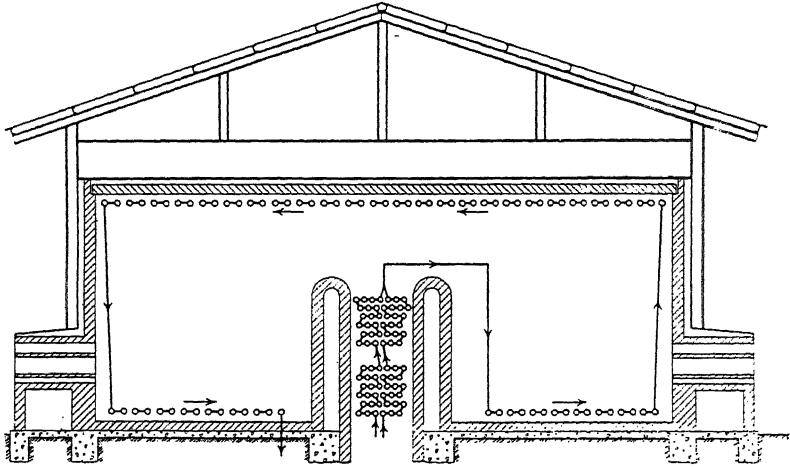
Foster Wheeler Heavy-oil Cracking Furnace.
